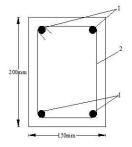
Cross section: 1 – Longitudinal rebars, 2 – close stirrups
